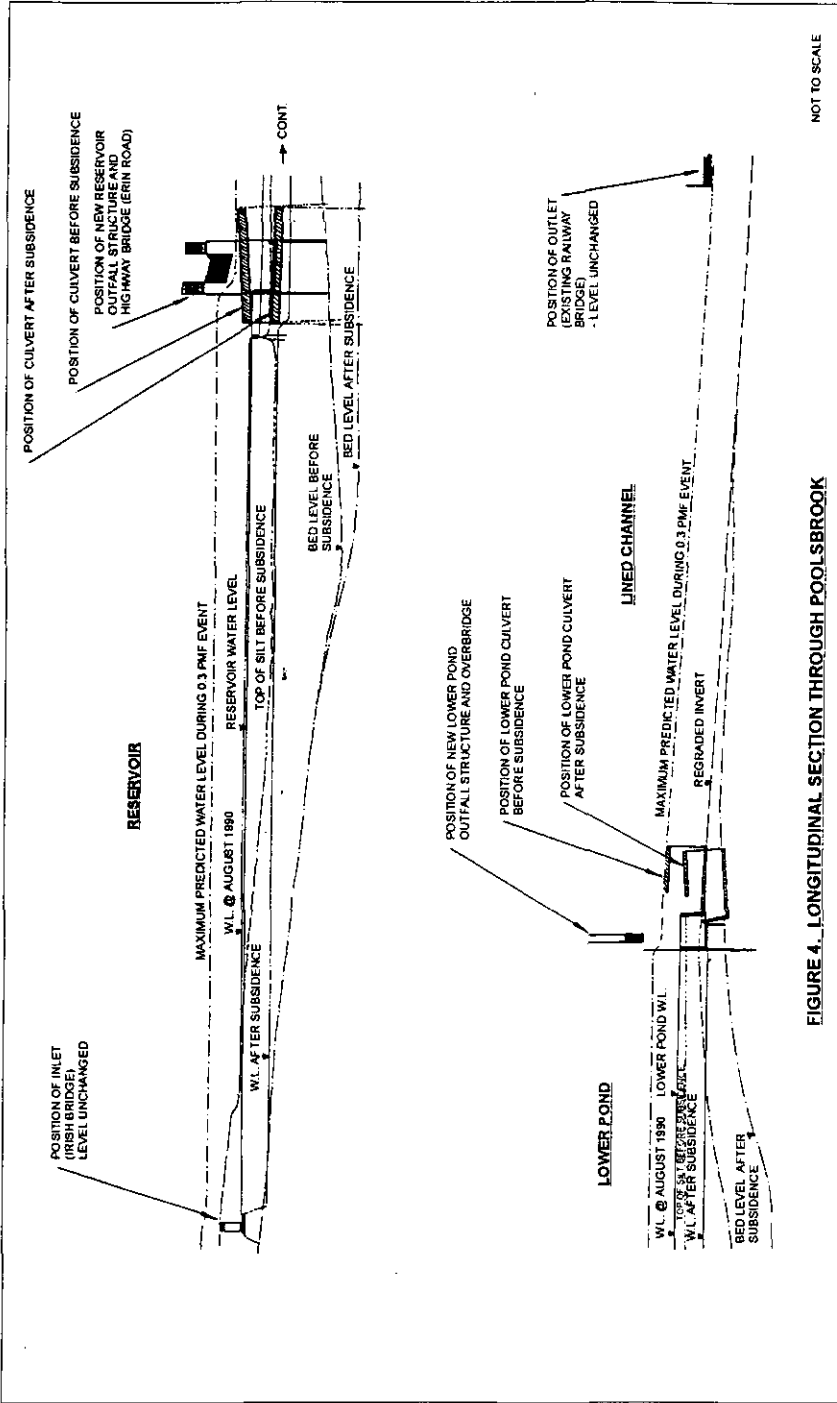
LONGITUDINAL SECTION THROUGH POOLS BROOK
